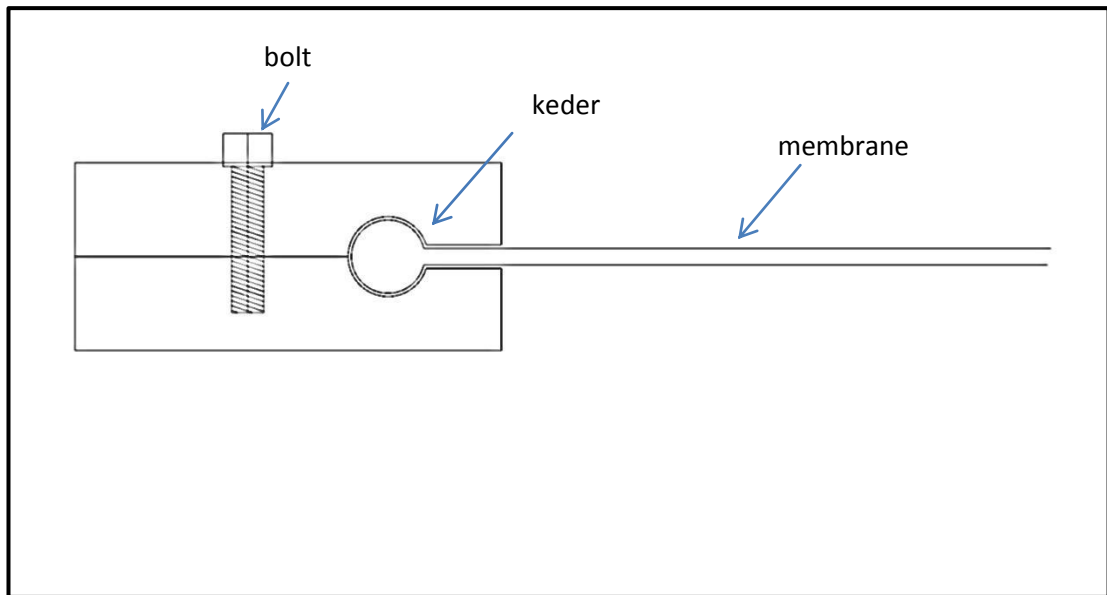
Keder non bolted flange system with the closing bolt external from the membrane without the need to punch holes that will diminish the active section of the tensioned membrane
